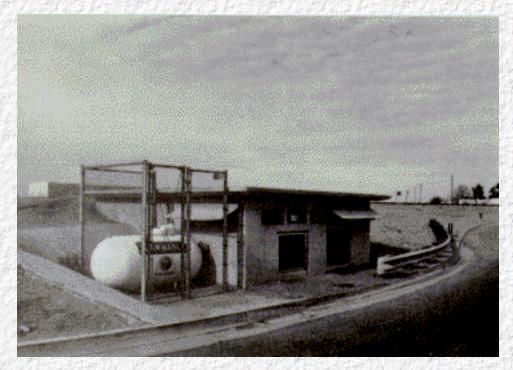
Older Station with Poor Siting Access is poor and exposed LPG tank is undesirable.
